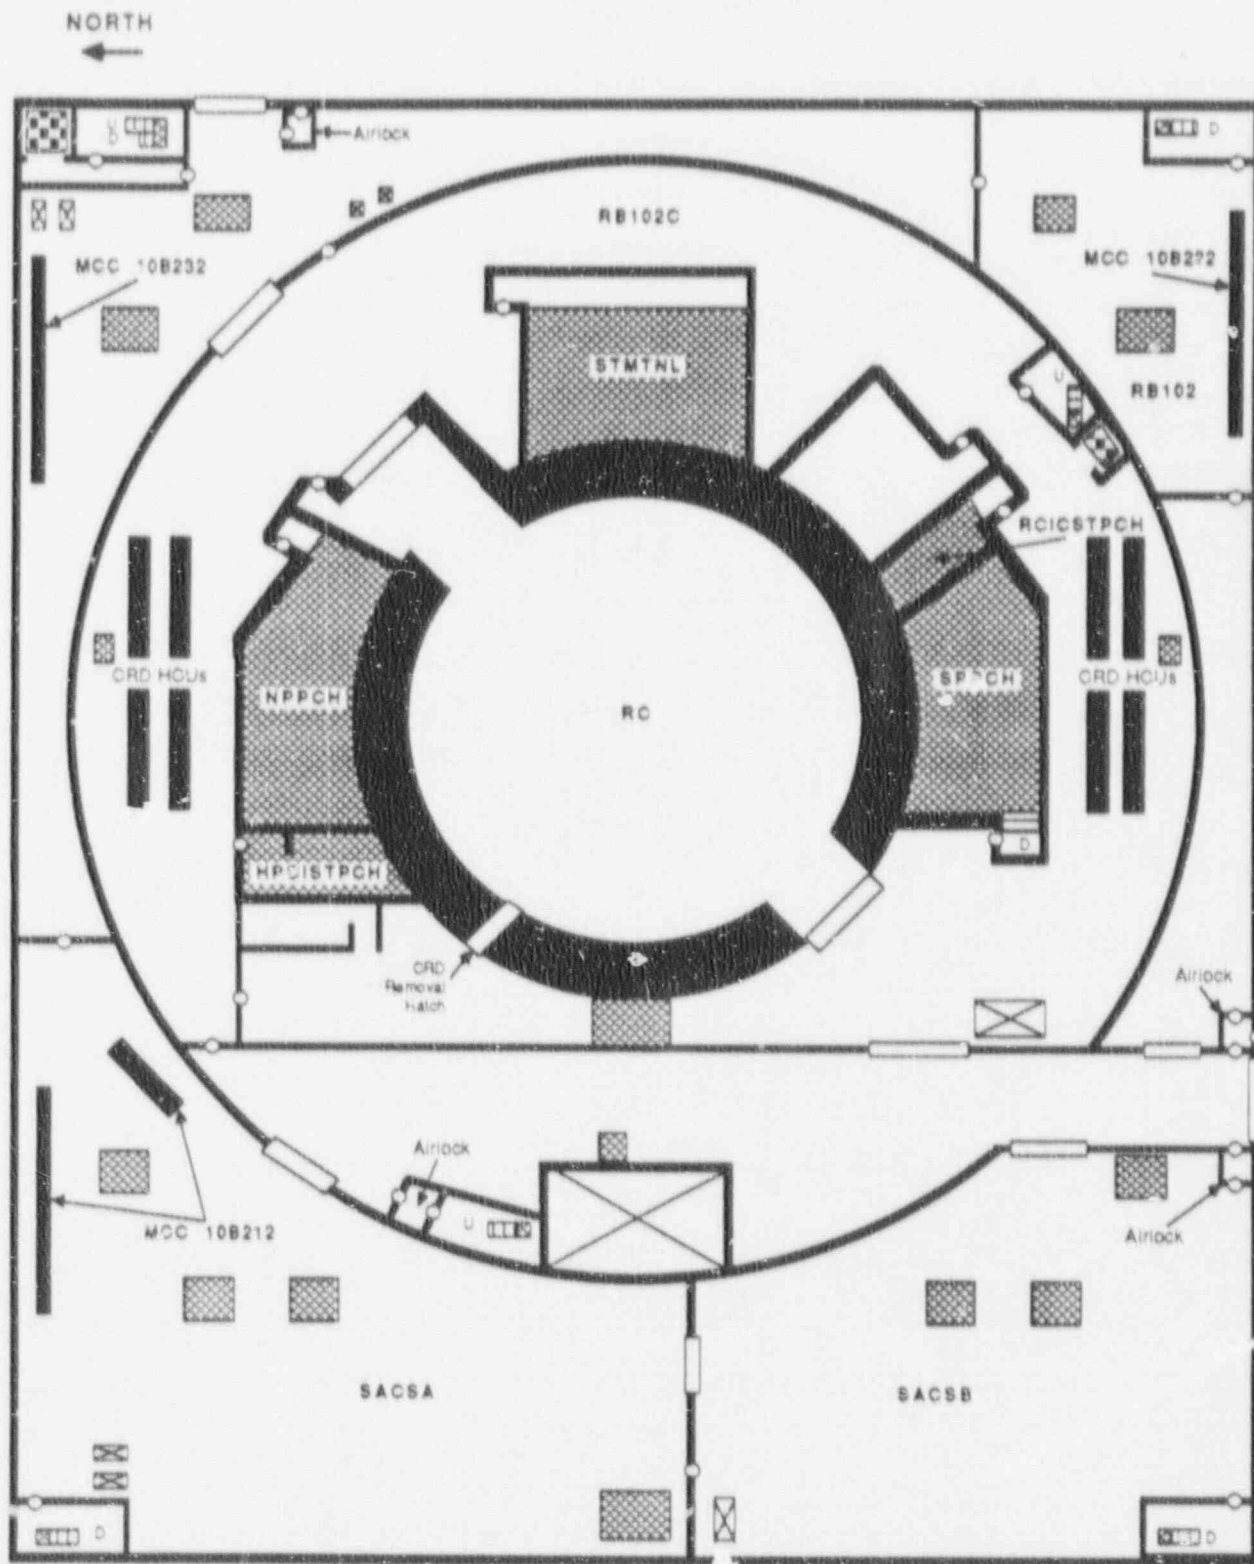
Hope Creek Reactor Building Elevation 102'-0"
